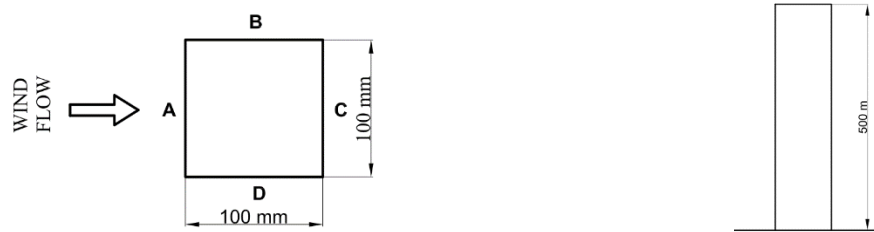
(a) Plan of square plan shaped building and (b) Elevation of square plan shaped building
